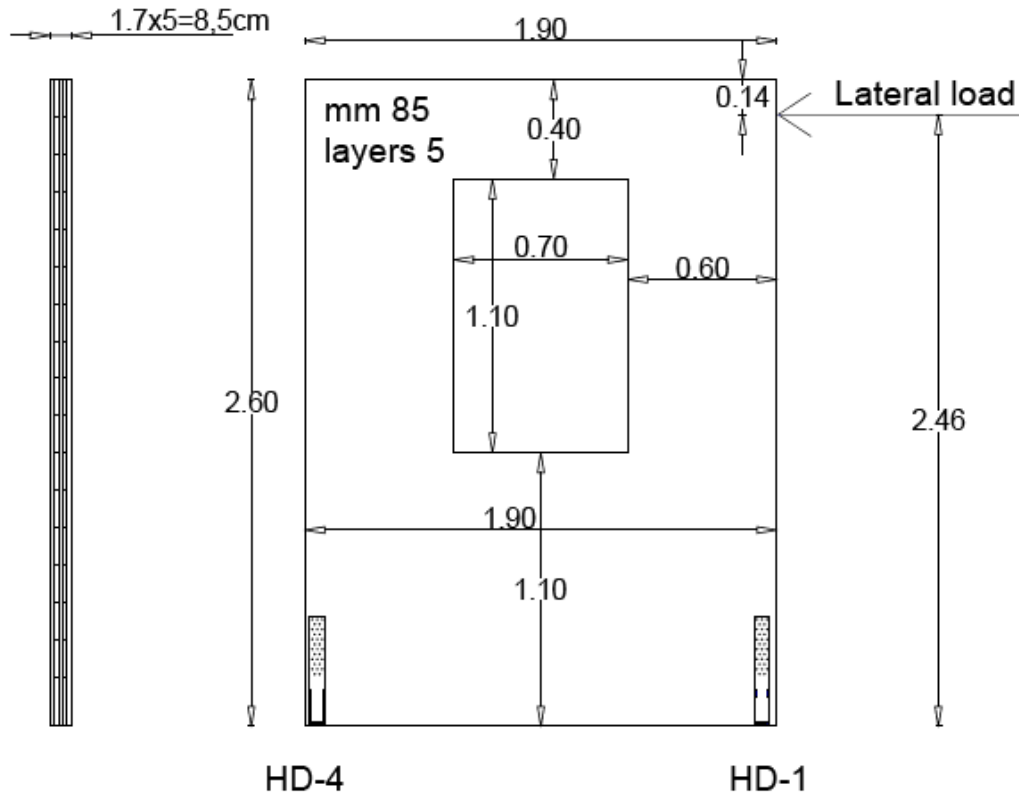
Detailing sketch of geometric configuration and connection system of shearwall 04
